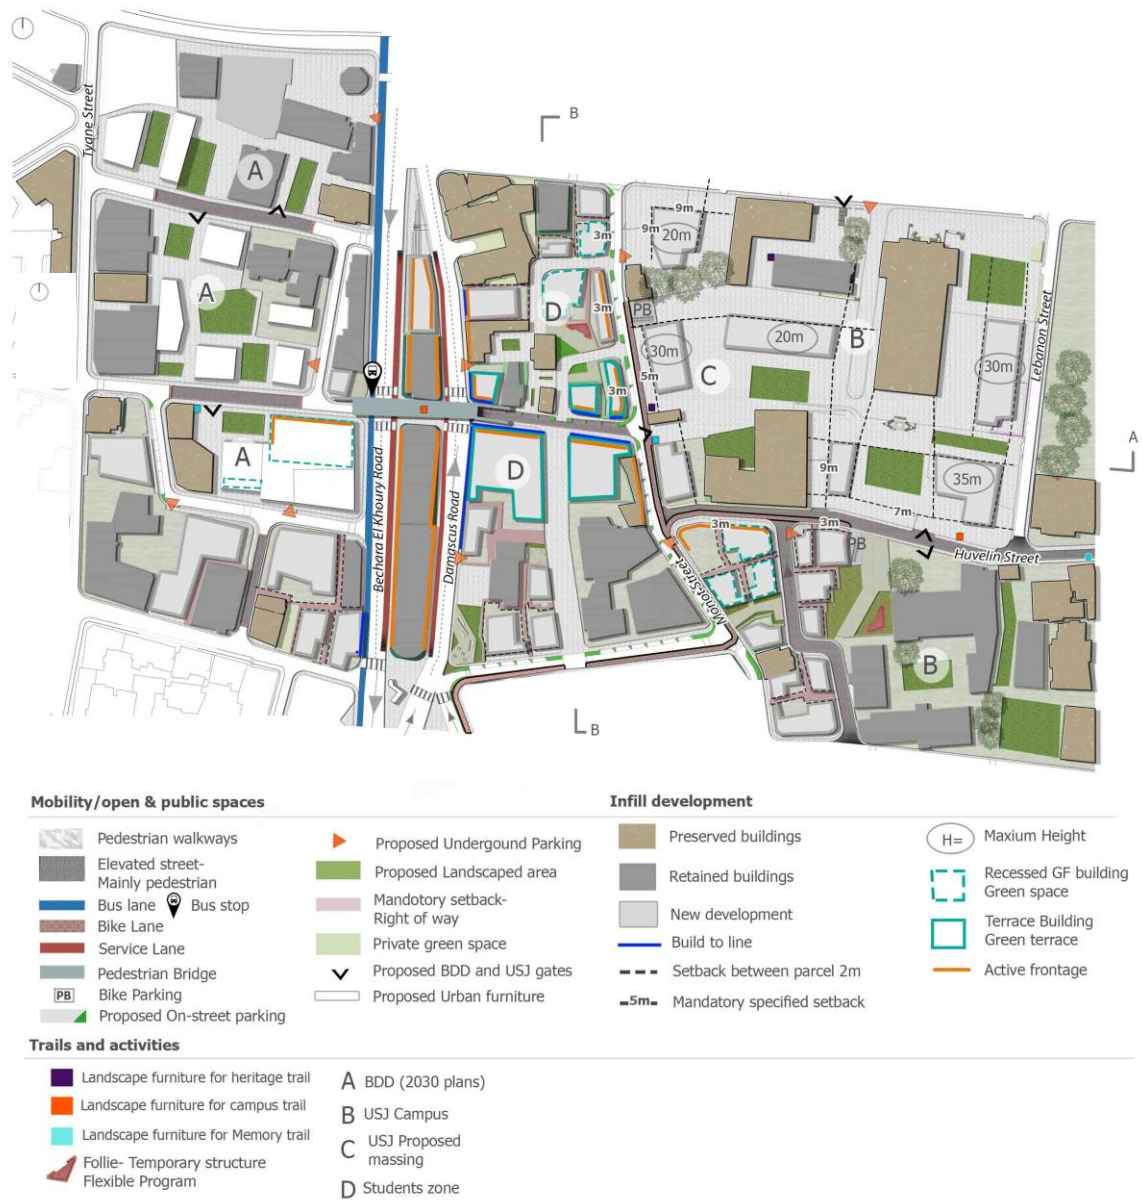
Urban Design plan of Zone B: The campus interface sector (Source: Author,2020)
